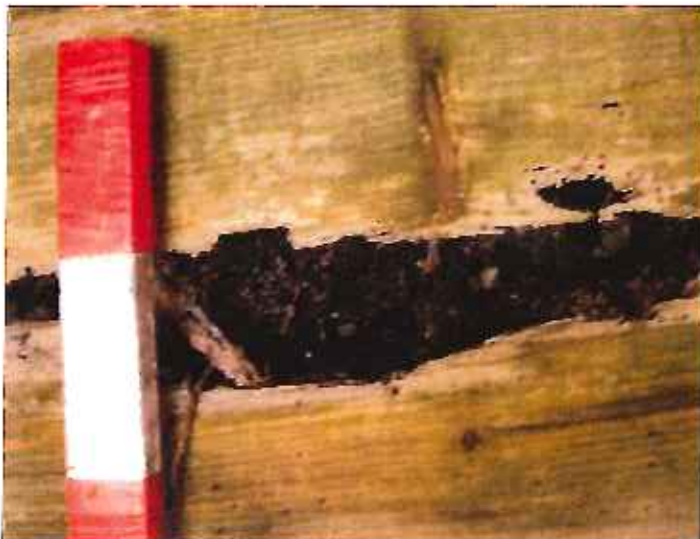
View Southwest through Wooden Portion of Retaining Wall
